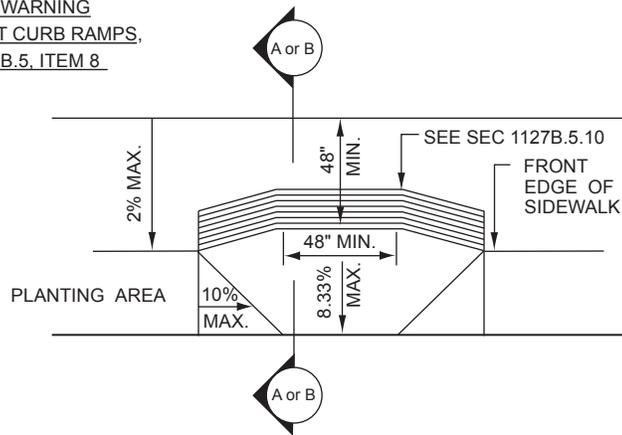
B-20B—CURB DETAIL—CASES C AND D
